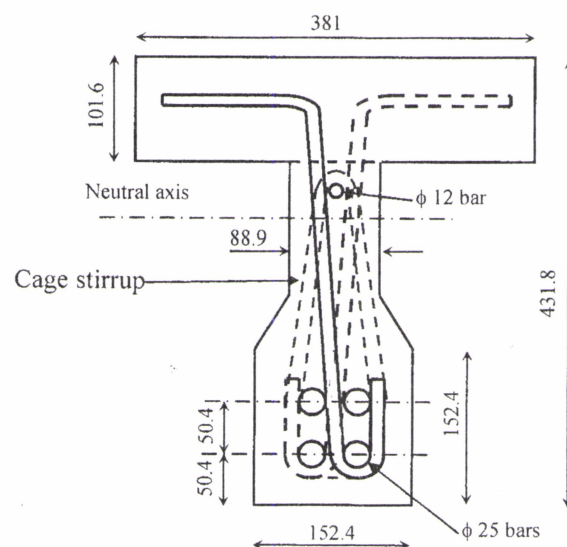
Beam cross section (Saemann and Washa, 1964).
